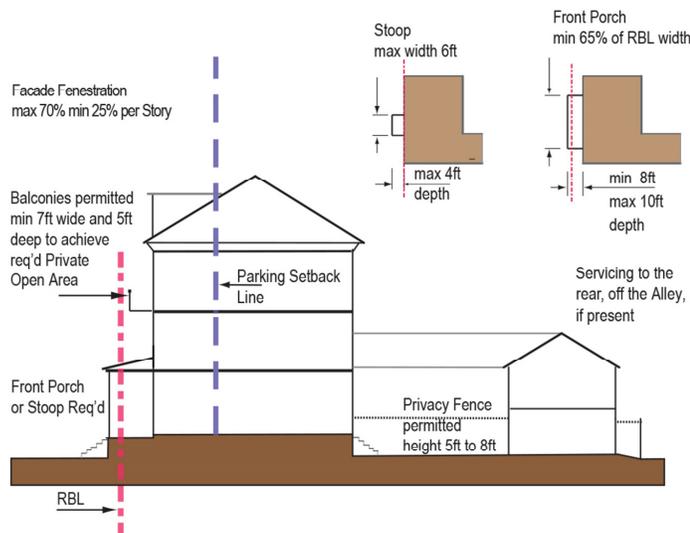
Townhouse/Small Apartment Elements Standards
